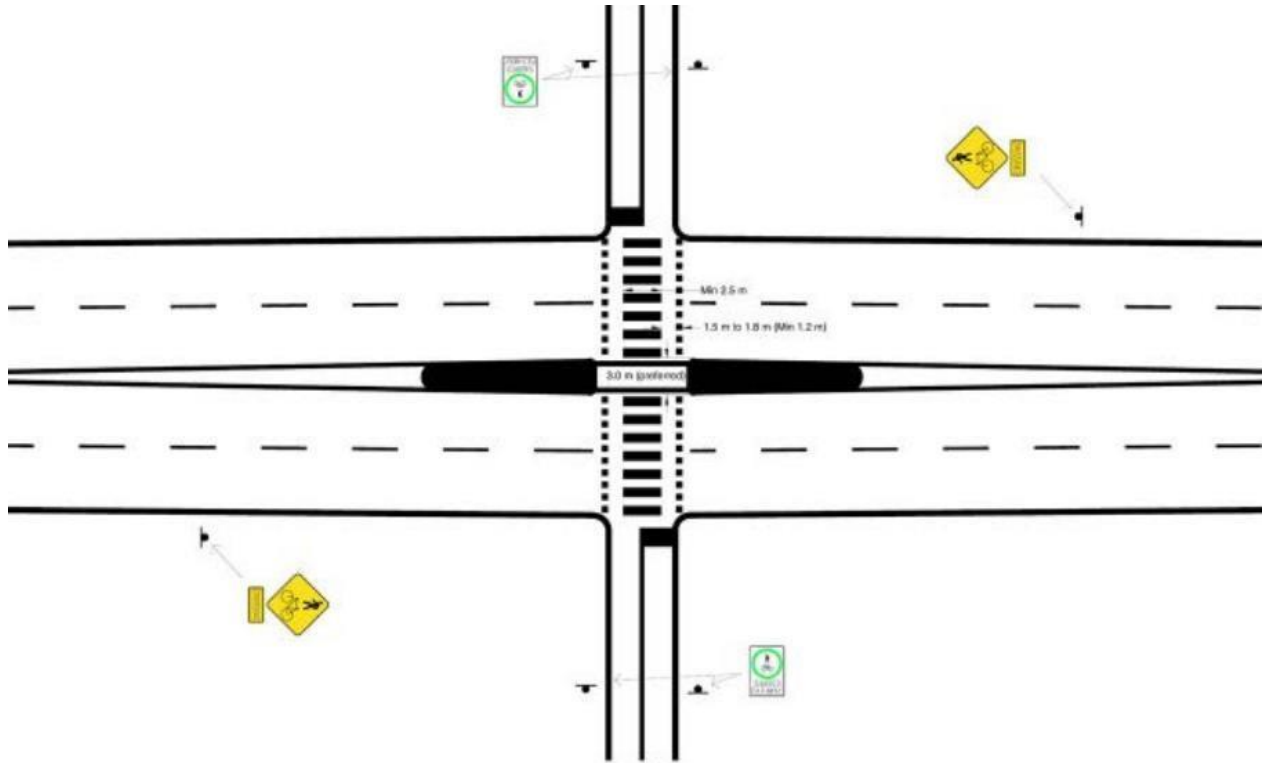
Elephant's Feet Crossing, with Zebra Markings (100 Avenue, West of 109 Street, Edmonton)
